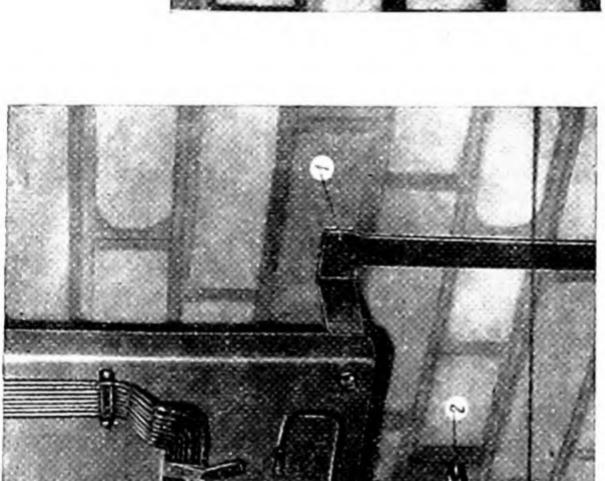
Supporting parts and anchors fixed to wall with powder-actuated gun and welding:
